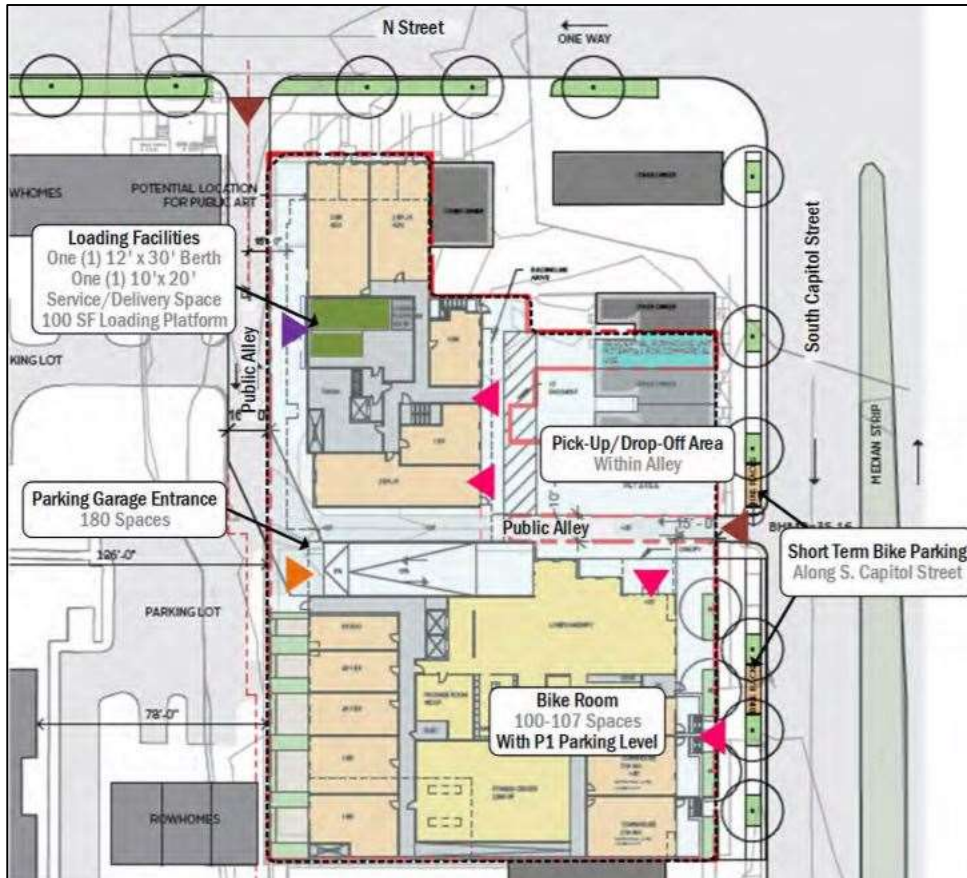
Site and Access Plan (Source: Gorove/Slade CTR, Figure 7, 9/11/2020)
